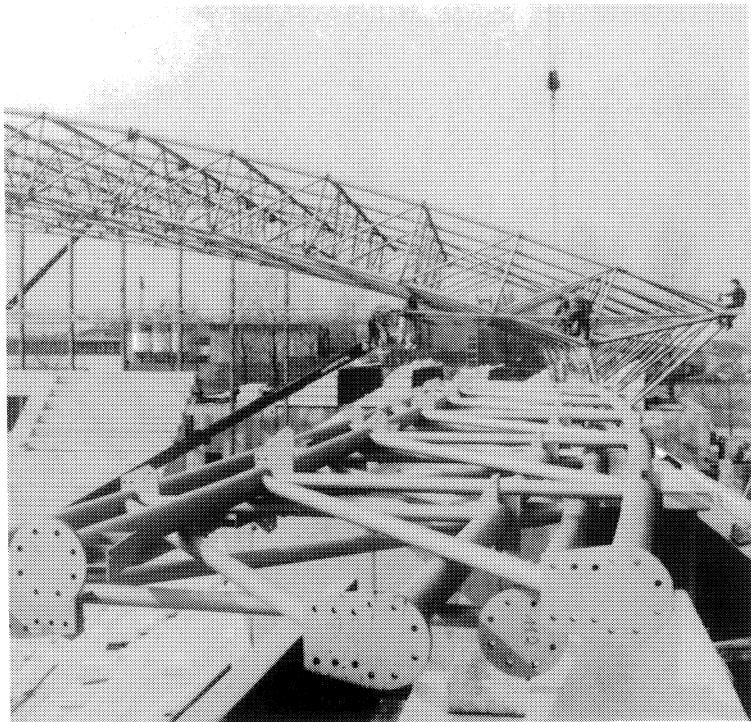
Erecting a CHS lattice structure for a stadium, prefabricated subassemblies are hoisted by a crane and flange-jointed
